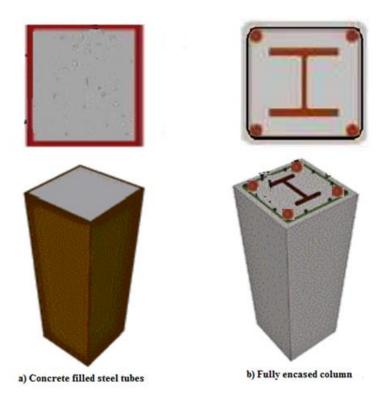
35: Composite Columns: a) Concrete Filled Steel Tubes and b) Fully Encased Columns With regarding to the beams, similar to structural steel alternatives built-up steel sections are used for girder and composite beams.
